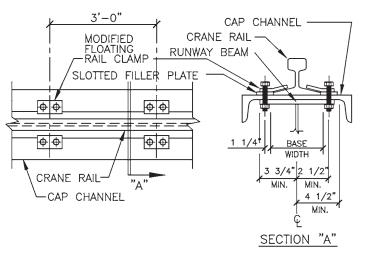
Attachment of crane rail to runway beam by floating clamps. The manufacturer typically uses 1-in ASTM A325 bolts with lock washers. (*Nucor Building Systems.*)
